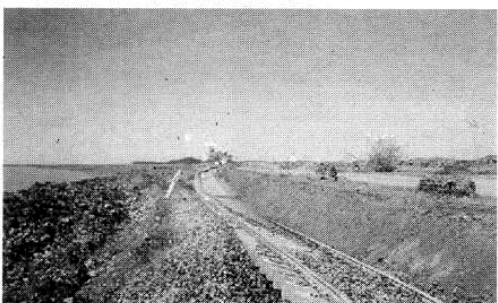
Massive slope failure of the rail-road embankment near Navlakhi port resulting in fracture of rails, and damage to prestressed concrete sleepers and panroll clips.
